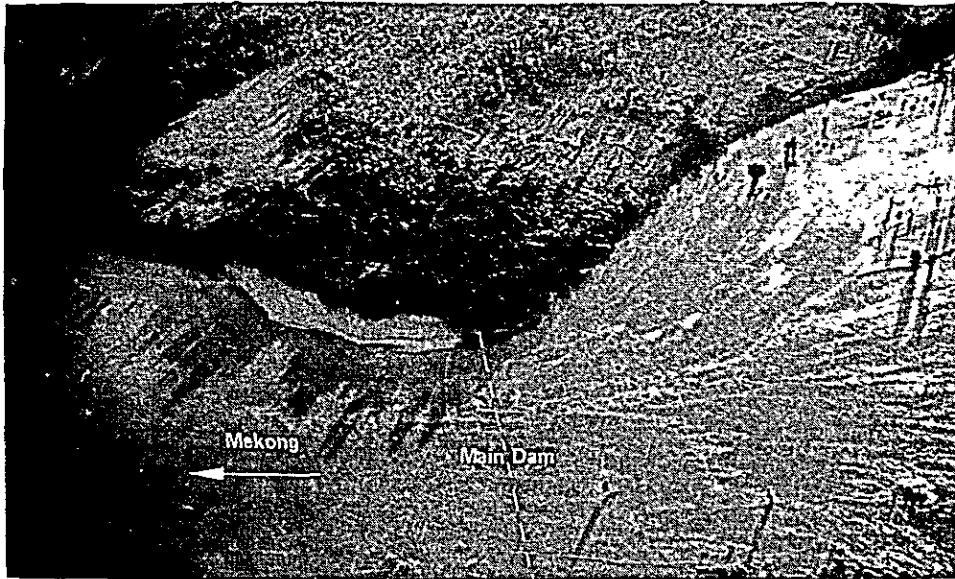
Right Bank of Sambor Dam Site (December 1964)
